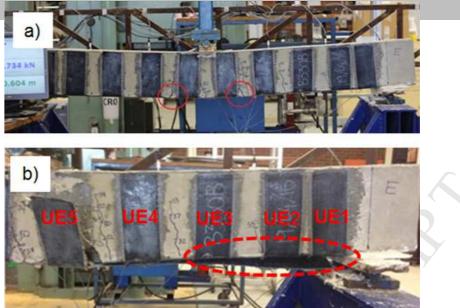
(a) Intermediate crack induced interfacial debonding of soffit strip of B330B; (b) Complete failure of B330B by debonding of soffit strip and rupture of UE1, UE2 and UE3
